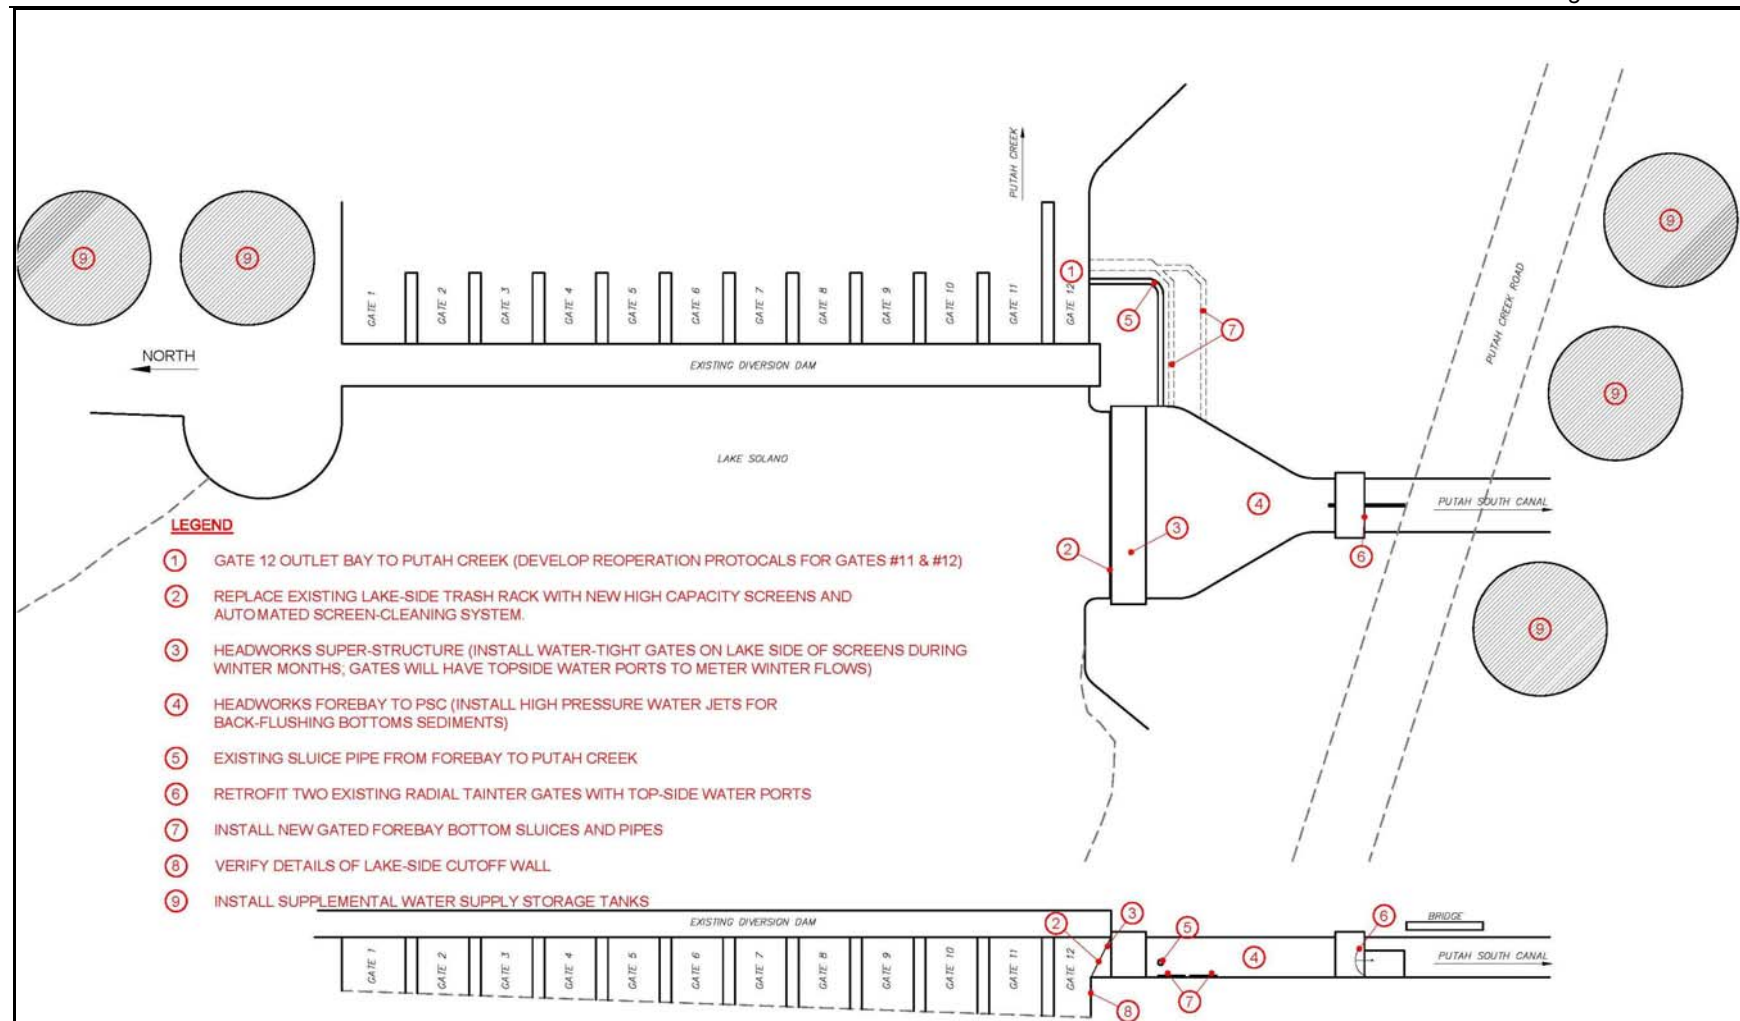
Recommended improvements to facilities at Putah South Canal Headworks and diversion dam.
